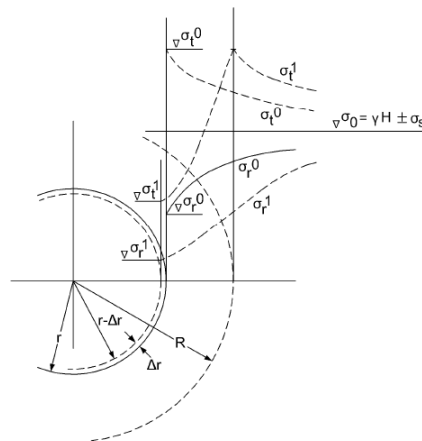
Surrounding stress conditions of a tunnel excavation
